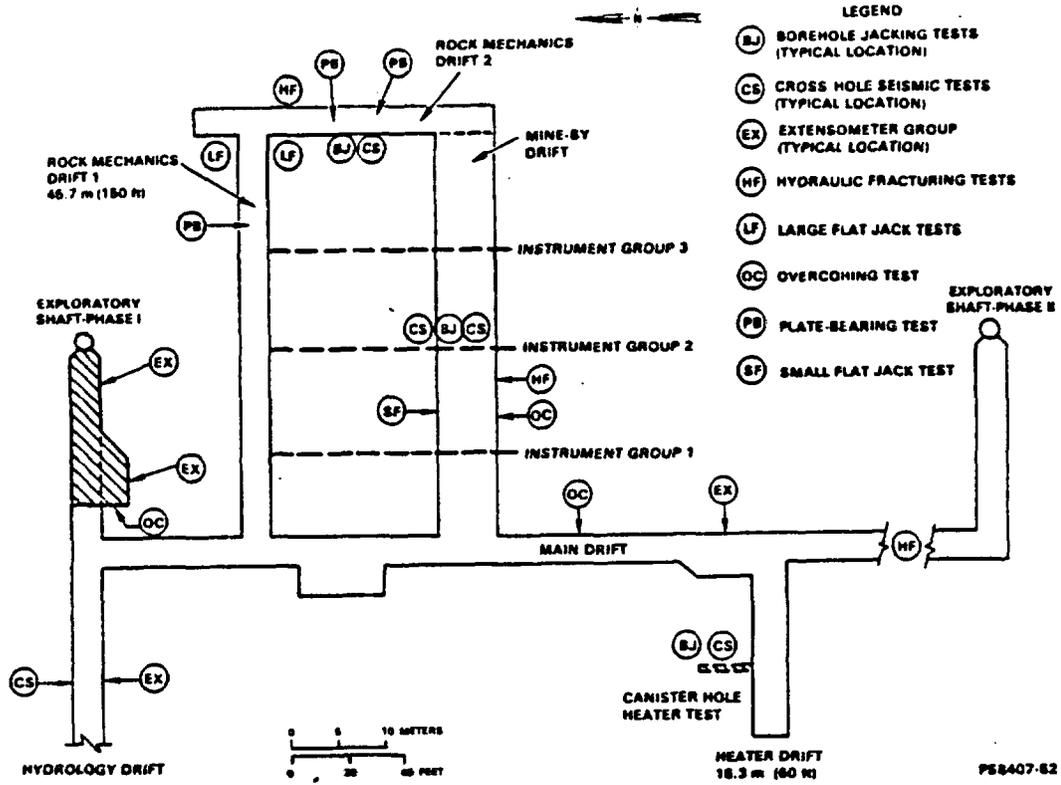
Plan View of ES-11 Facility Showing Rock Mechanics Test Location.
